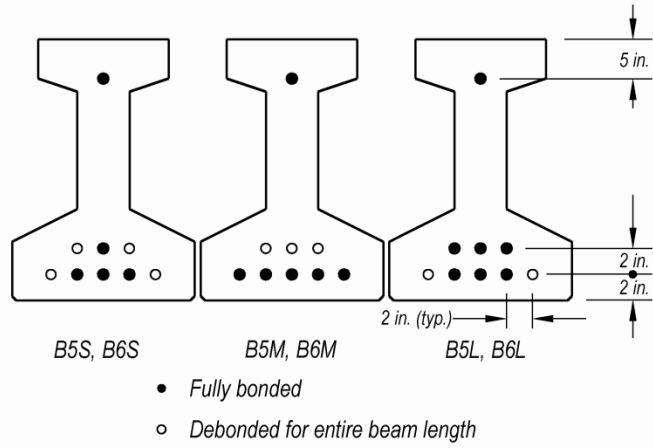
Strand layouts for beams containing 0.5-in. and 0.6-in. strand
